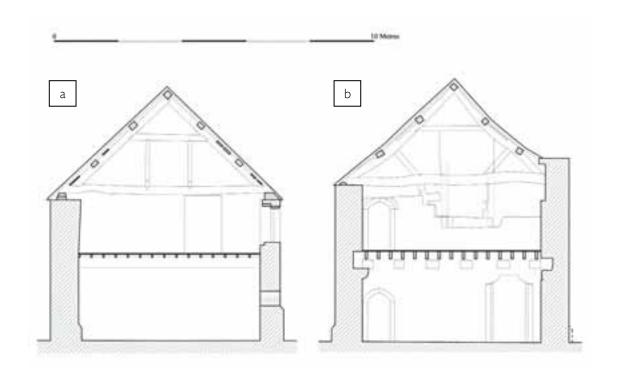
a) Truss T4, floor and section from NW Farm Building, and b) Truss T5, floor and section from Solar Wing, both of Storeton Hall Farm outbuilding. Based on a figure supplied by Mark Fletcher, Matrix Archaeology
